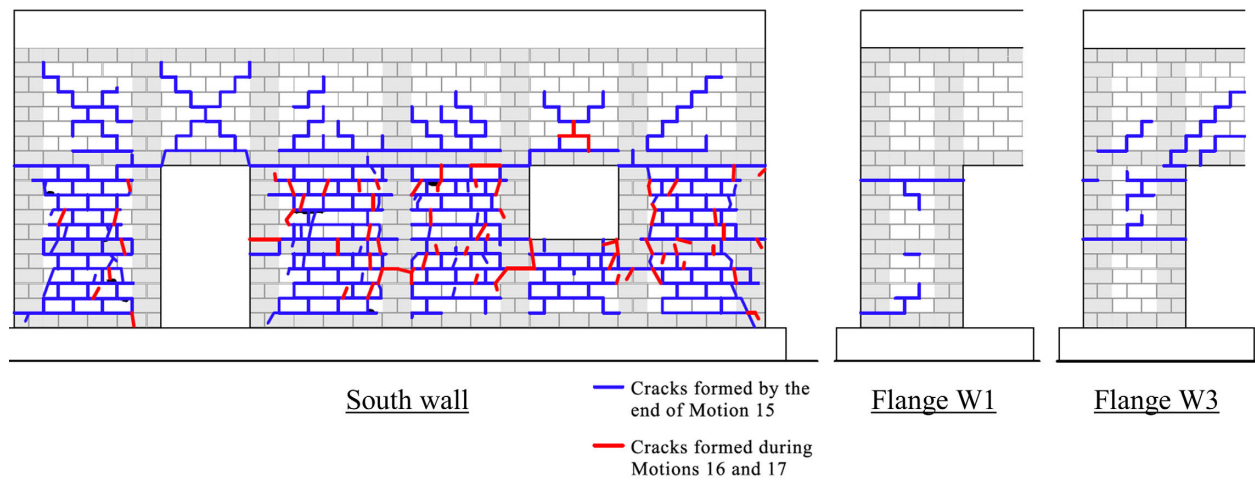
Crack pattern of Specimen 2 in south wall and flanges.
